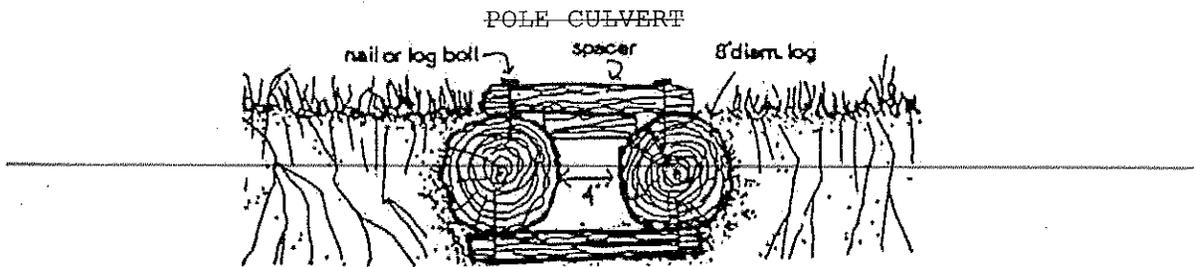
Proper Construction of Pole Culverts on Logging Roads.
